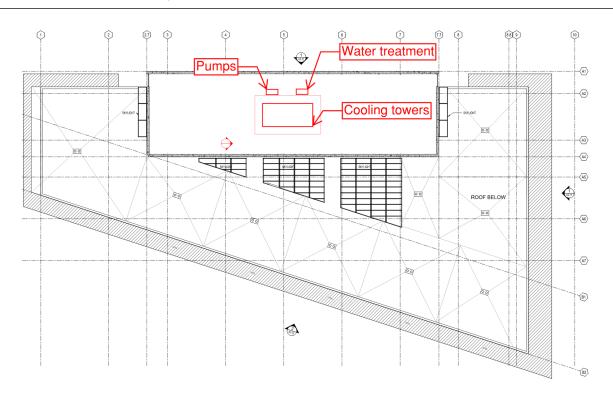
Plan view of potential cooling tower on future library roof. Location 4.
